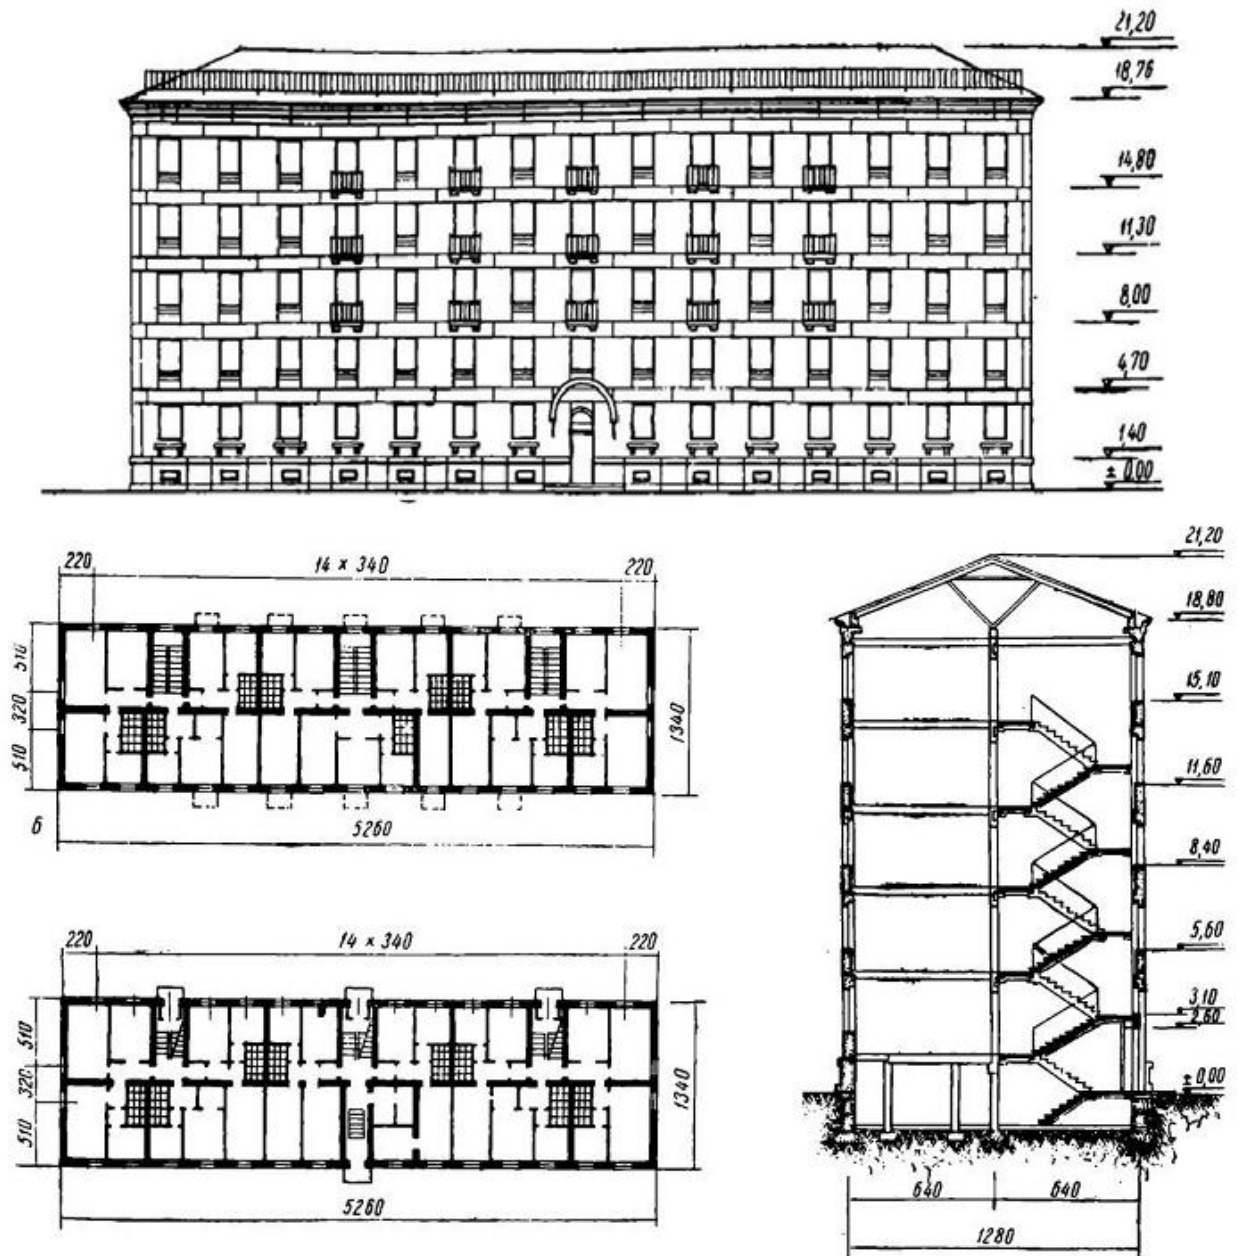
Façade, floor plans and section of a 1-415 house [3]
